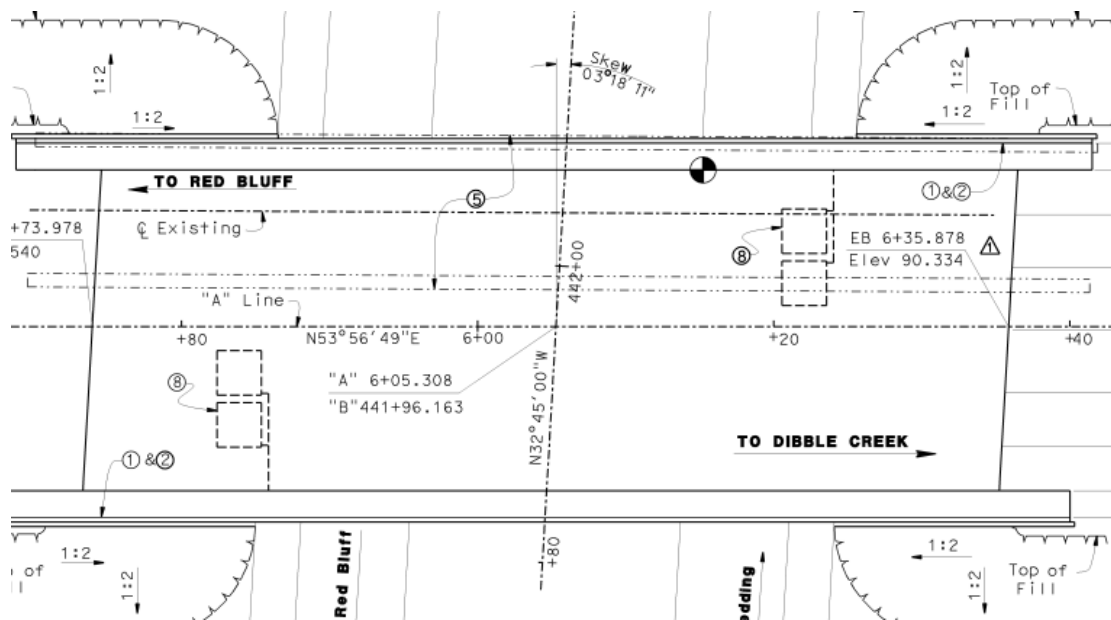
Schematic Plan view of Adobe bridge (drawing provided by Caltrans)
